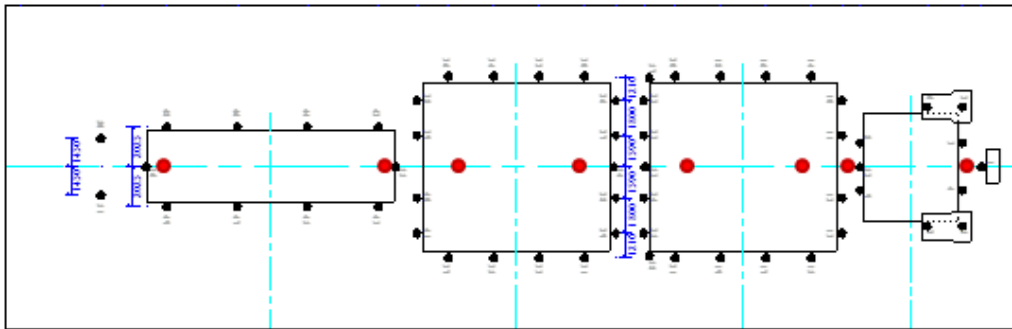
A top view of the location (in red) of bearings of turbo-generator.
